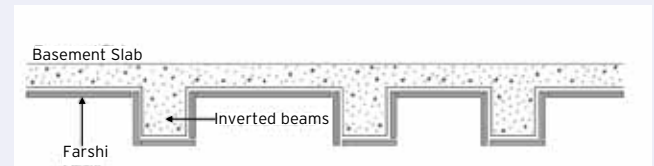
Typical waterproofing detail of a basement by lining system (Box type waterproofing)
